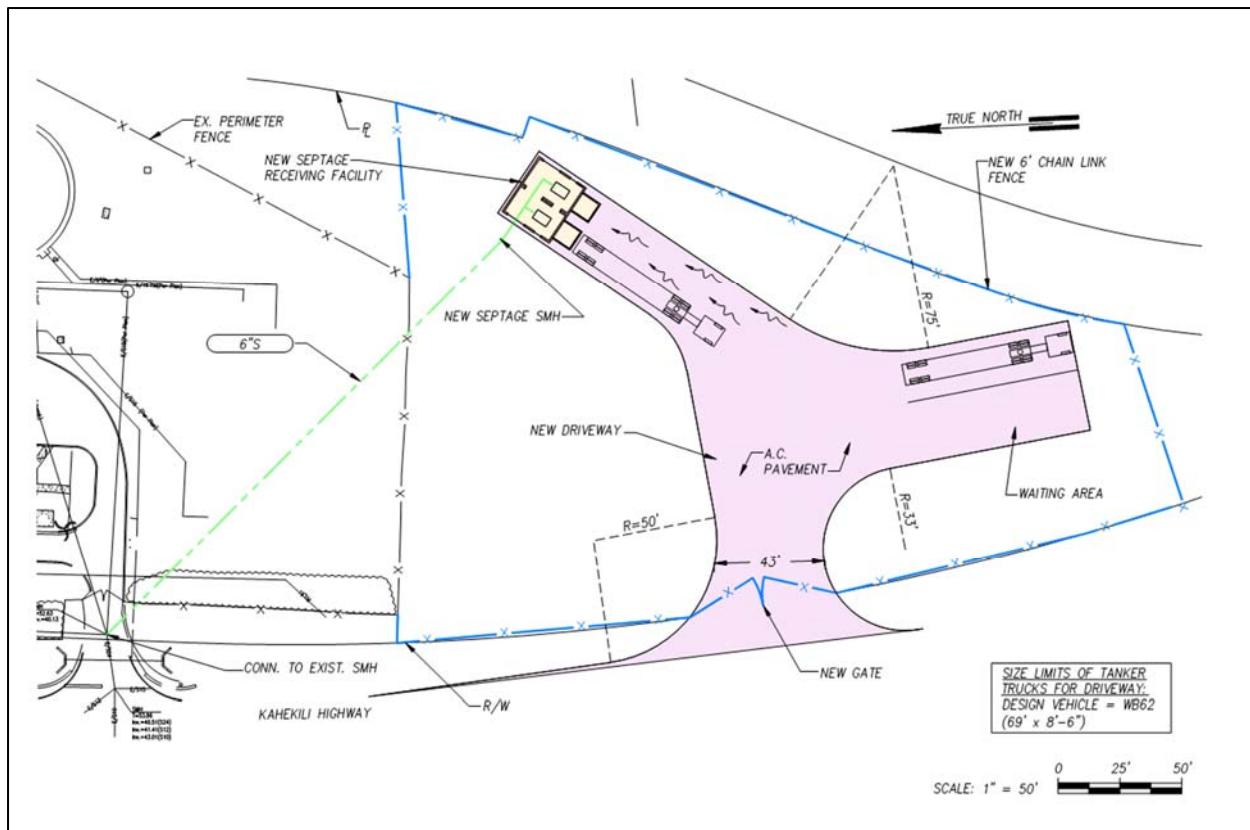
Septage Receiving Facility (Source: Elemech Inc.)
